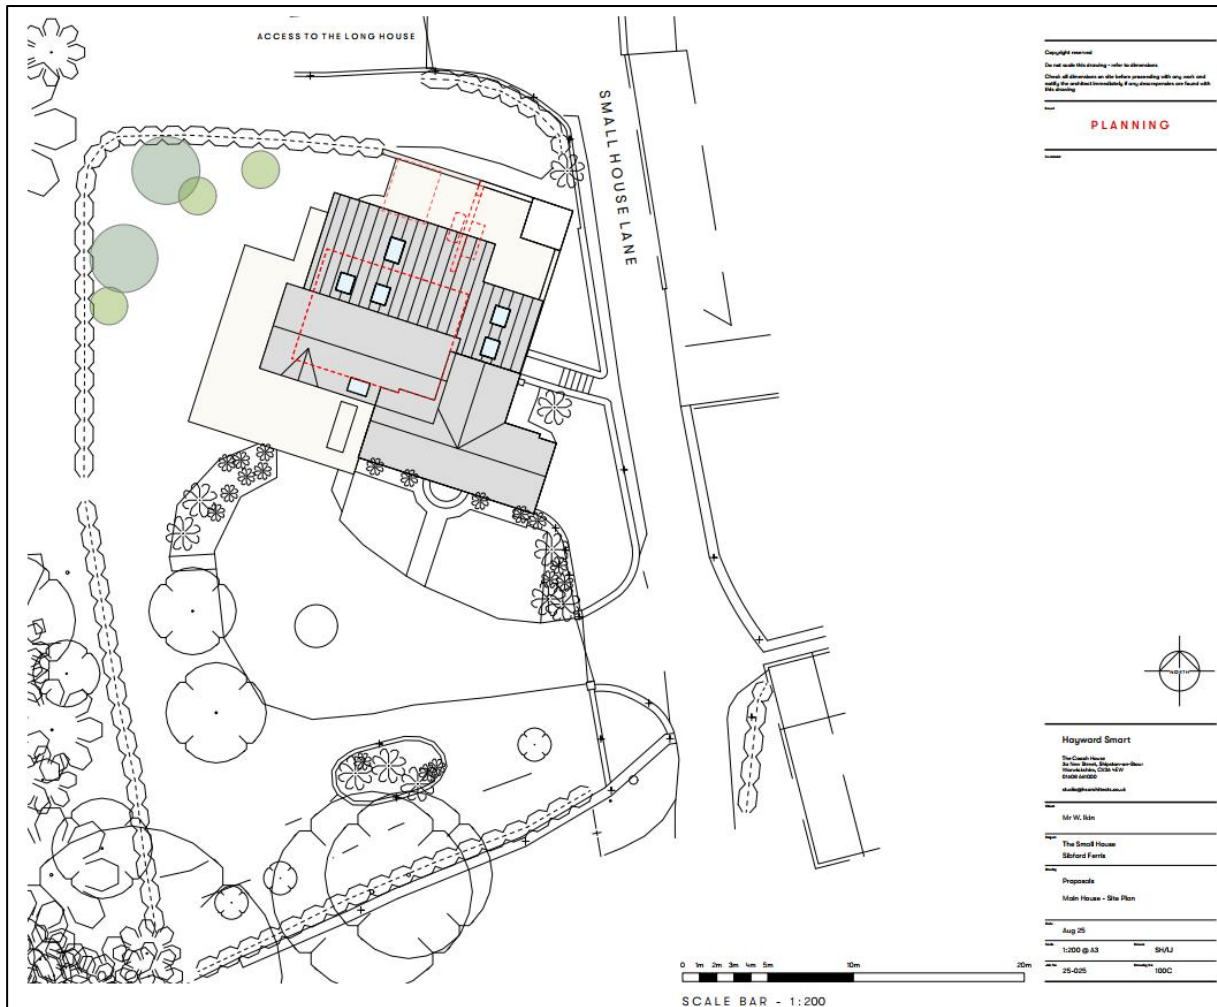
Proposed site plan (© Hayward Smart Architects 2025: 25-025-100C)
